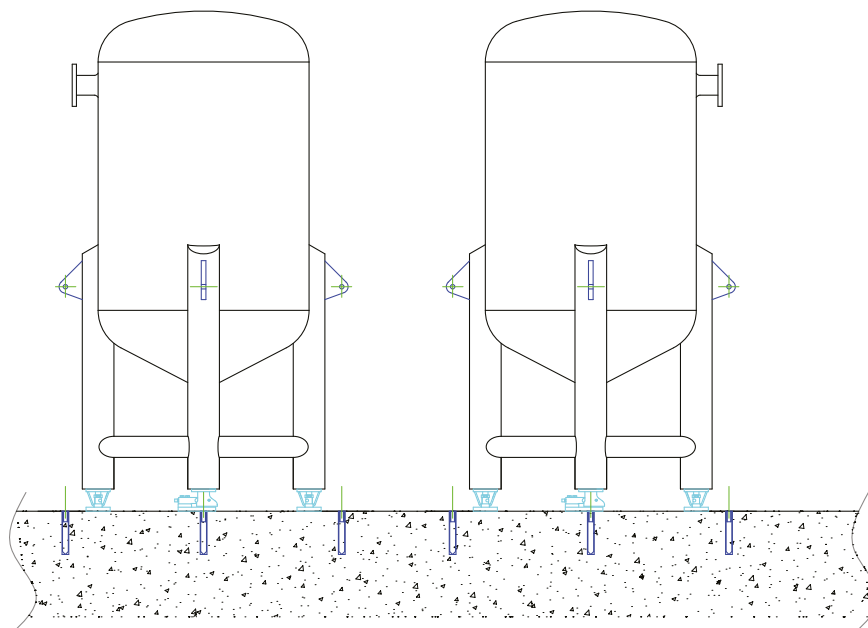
, Tanks mounted on a rigid foundation at ground level
